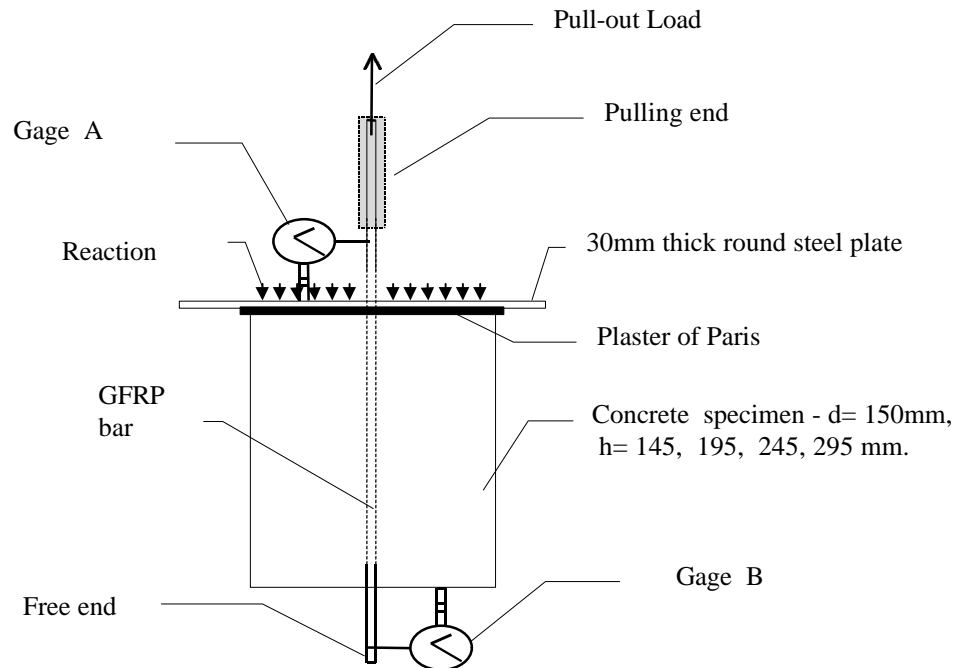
Test set -up for bond test of GFRP bars embedded in concrete.
